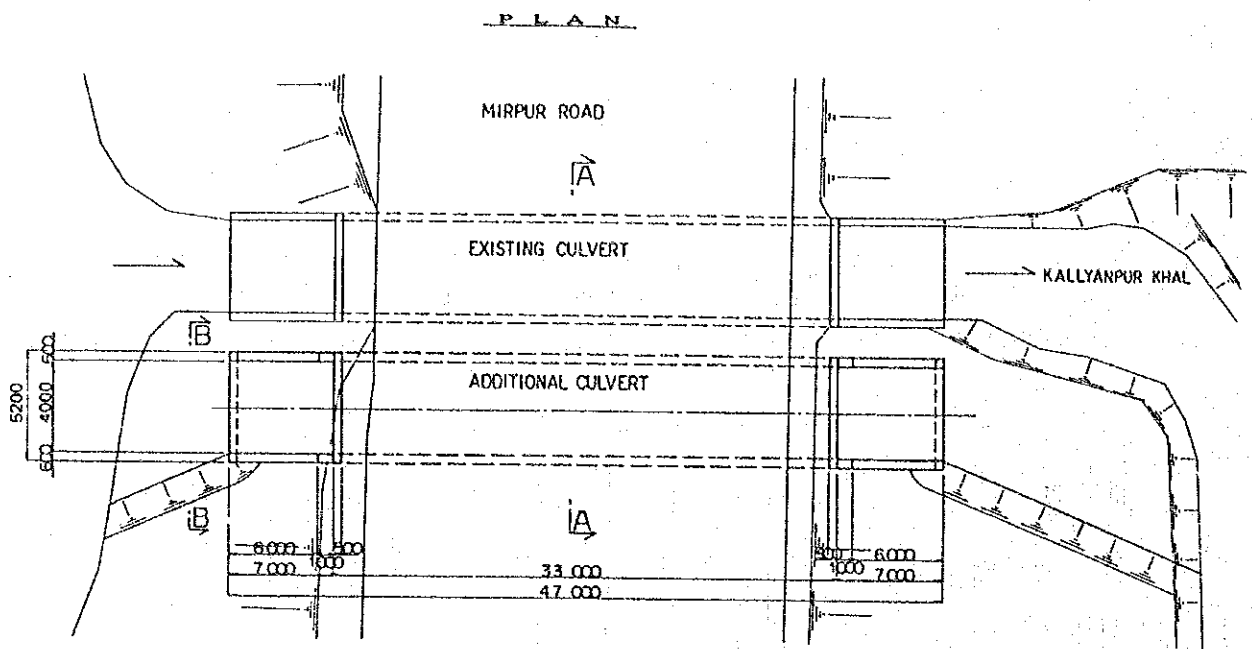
4 TYPICAL DESIGN OF BRIDGE CULVERT AT KALLANPUR KHAL
